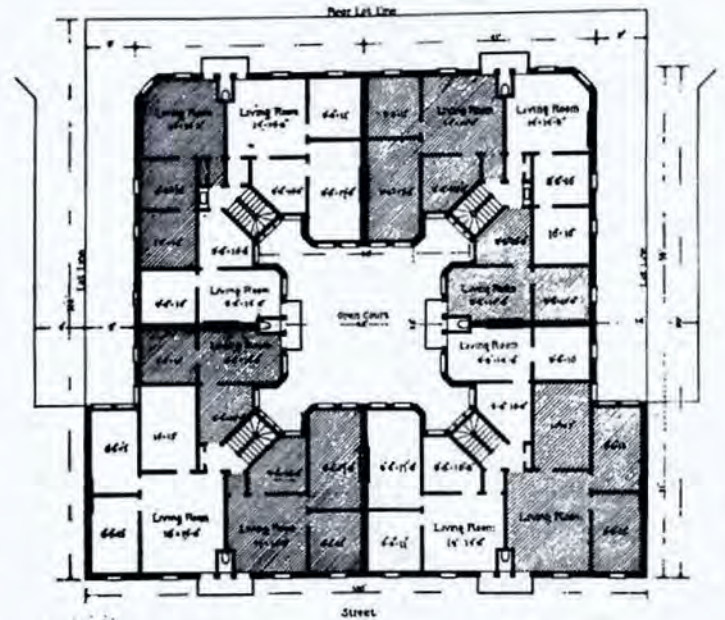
Model Tenement Design. Ernest Flagg. 1894. Plan of typical floor.
